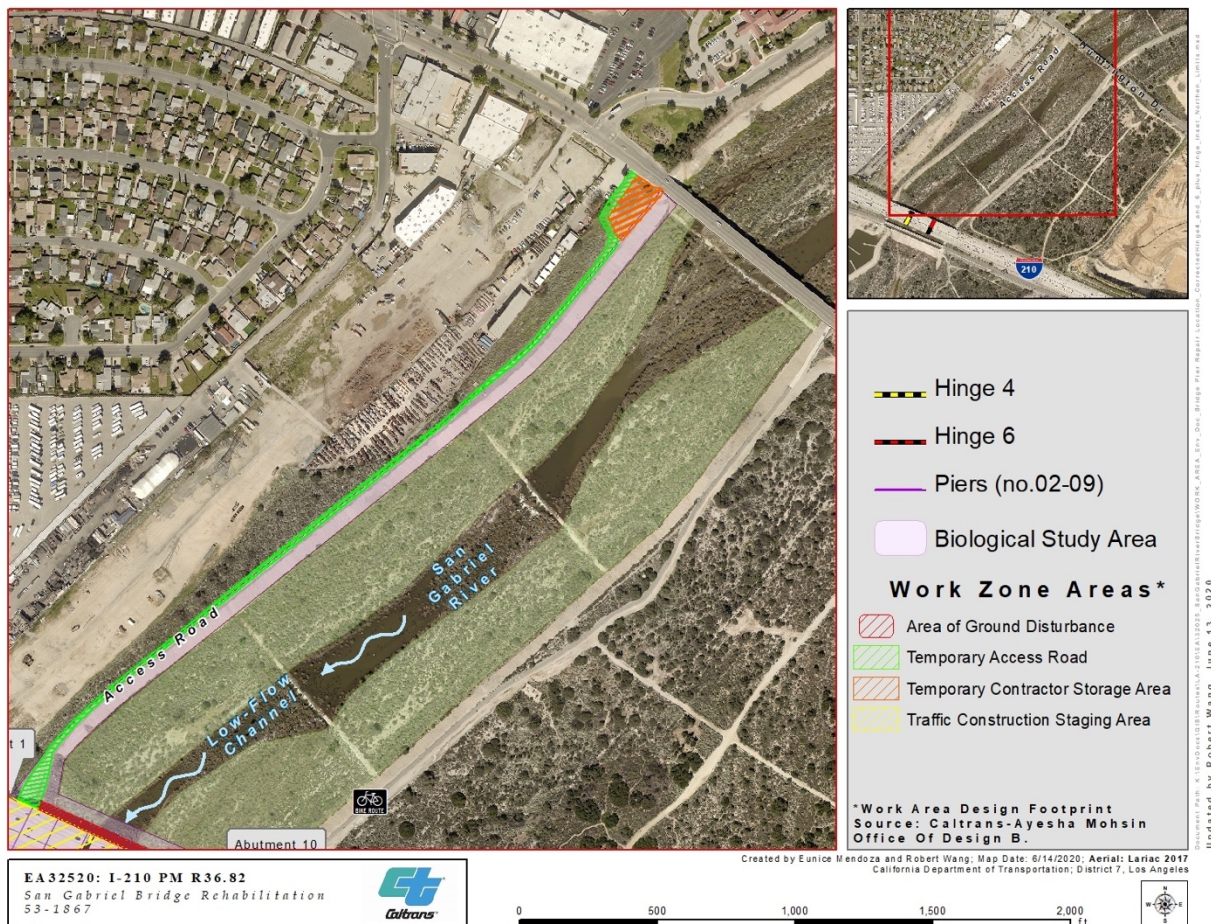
b. Temporary Construction Easements and Contractor Storage and Staging Area
